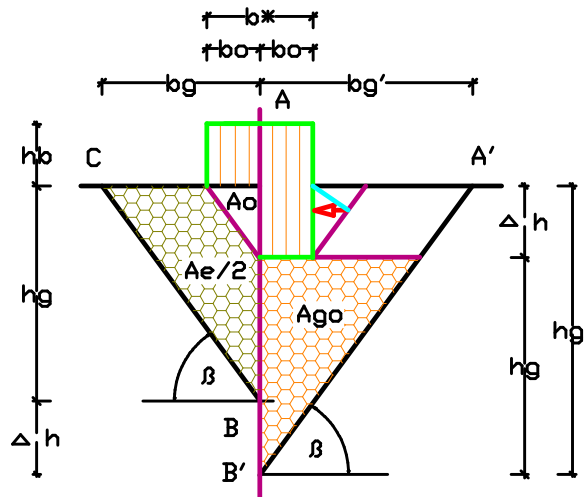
Strip foundation with active force areas – without (left) and with anchoring depth Δh (right).
